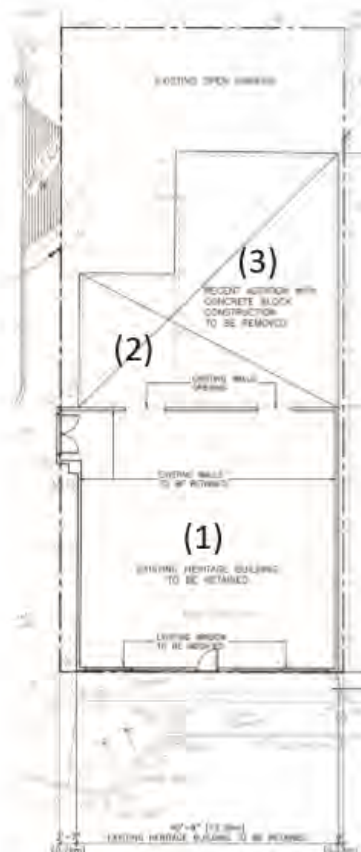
Site Plan of the three components of 3831 Moncton Street: (1) the original retail and residential building fronting Moncton Street, and (2) the gabled rear addition, both to be rehabilitated and (3) the concrete block flat roof addition, proposed to be removed.
